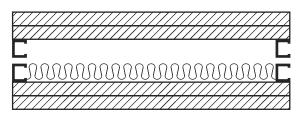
C7f: Two rows of 64 mm steel studs at 600 mm centres (Method 2)
